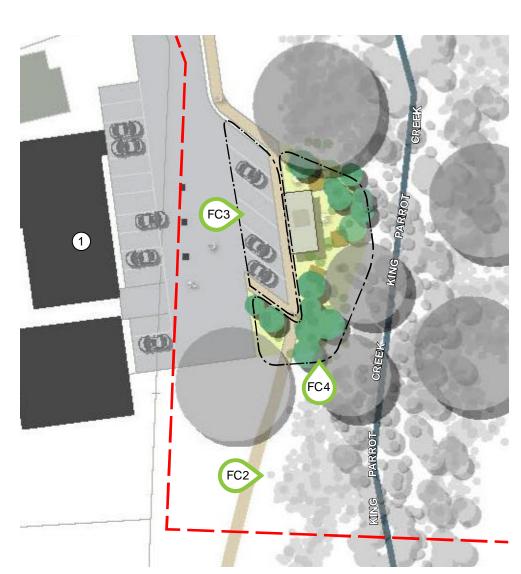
Flowerdale Central proposed streetscape master plan (south)
